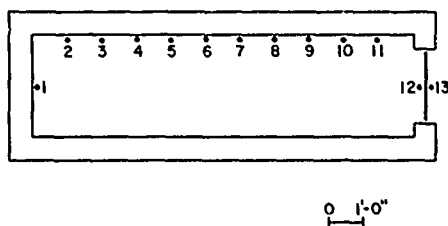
Film dosimeter locations in basement reinforced-concrete room shelter in two-story frame houses; Stations 1-31.1 b-1 and b-2.
